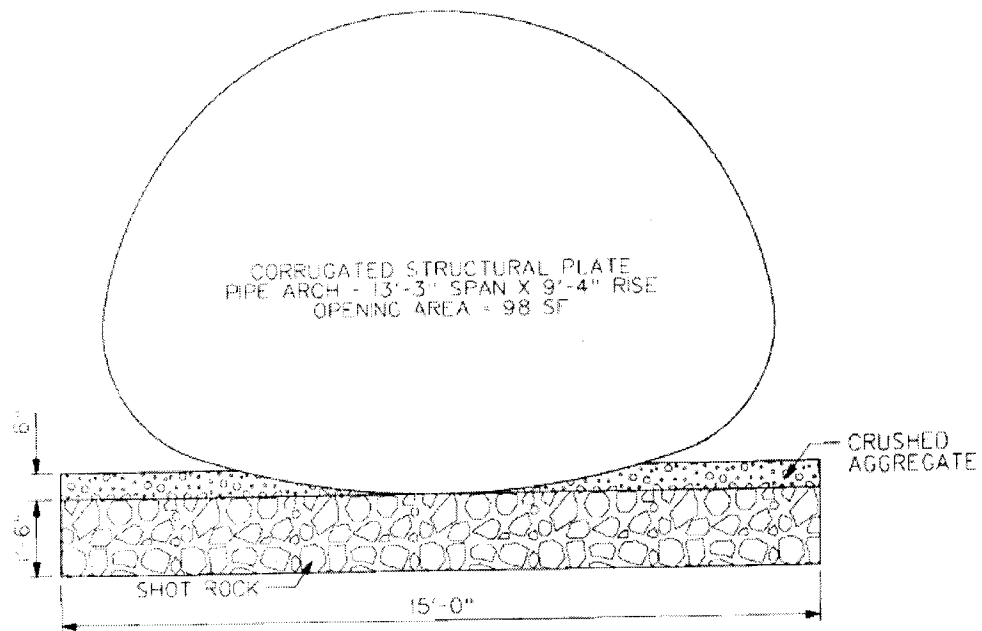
TYPICAL PIPE ARCH CROSS SECTION
